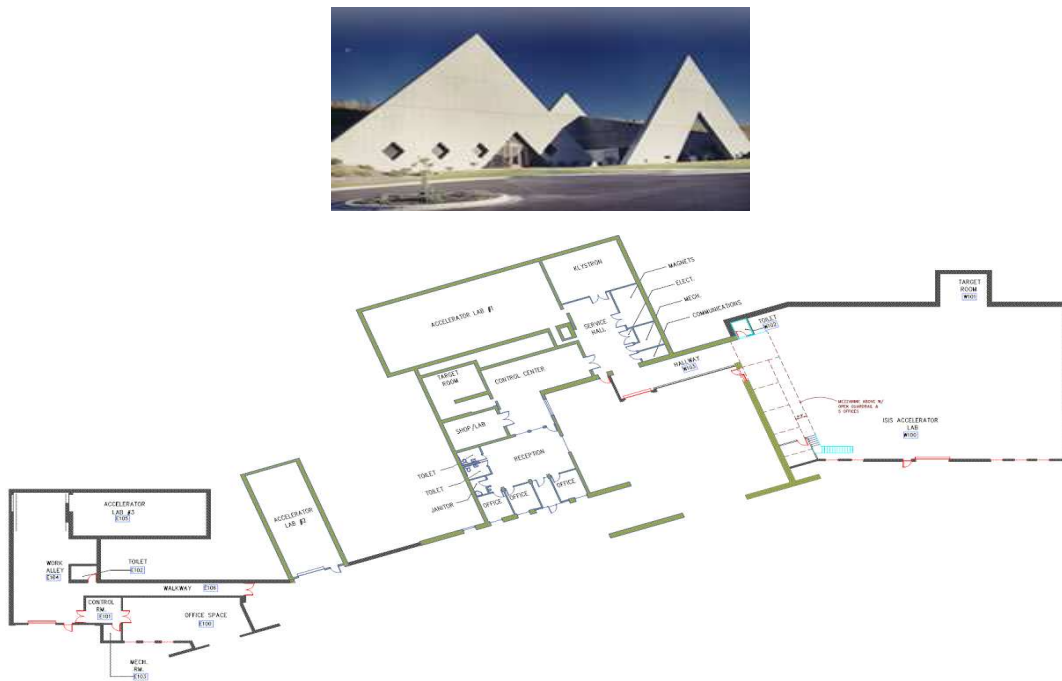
A picture of the IAC building appears in the top. The bottom is a floor plan of the facility which will be used for this project
